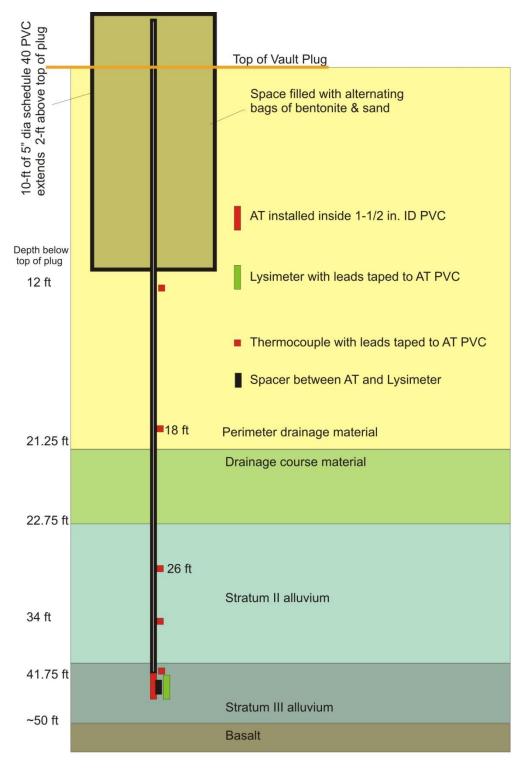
Vertical section showing instrument locations in the LCC-West-45 drilled borehole. This borehole has one AT but does not have a WCR.
